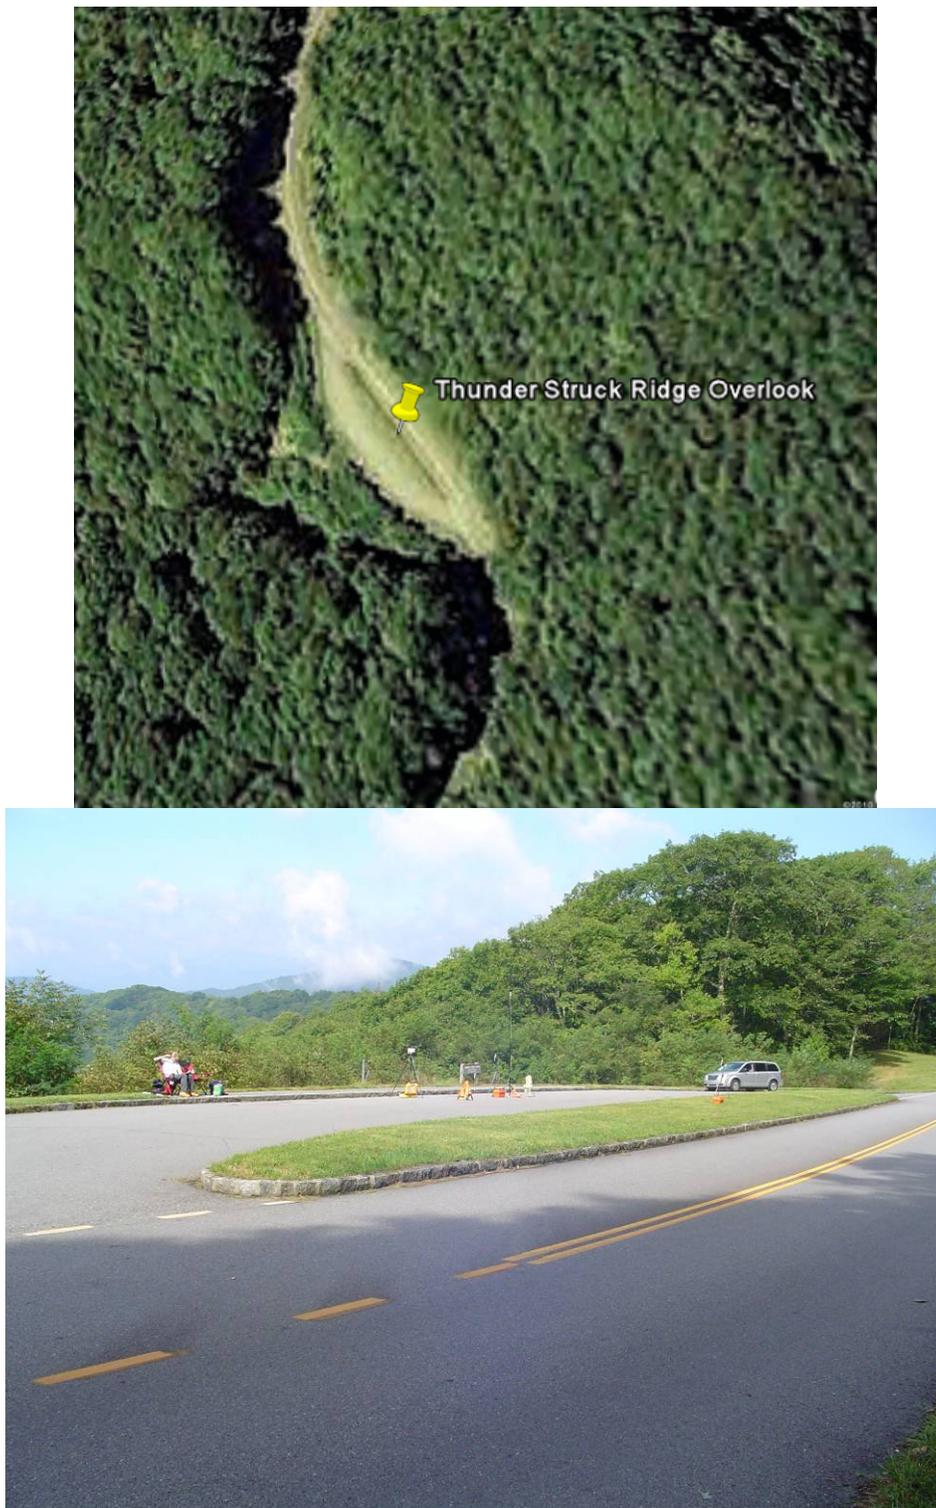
BR01R – Thunder Struck Ridge Overlook, aerial and site photos.
